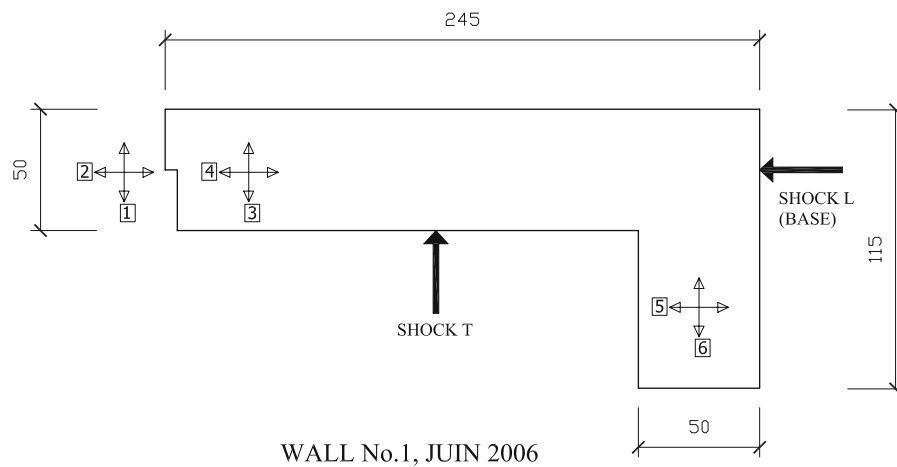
Sensor layout on wall No. 1 and application of shocks. Sensors 1 and 2 are placed on the concrete foundation and sensors 3, 4, 5, 6 are placed on top of the wall
